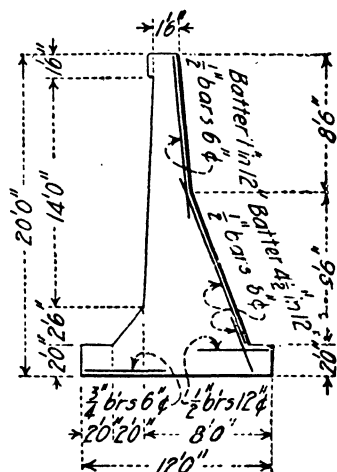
RETAINING WALL, C. B. & Q. R. R.
